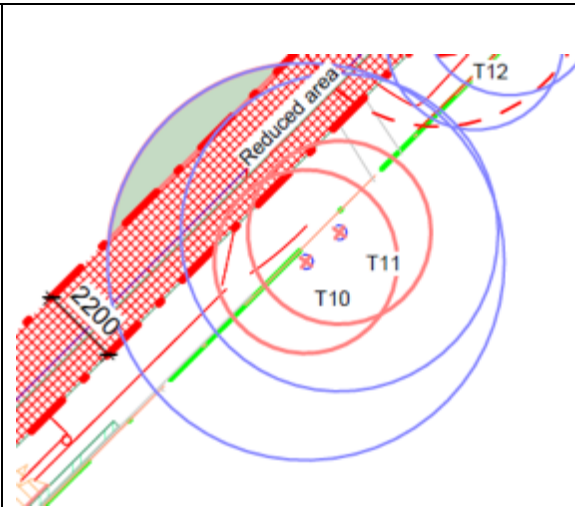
Basement 1 Plan – Tree 10 - Showing suspended slab (couter level).
